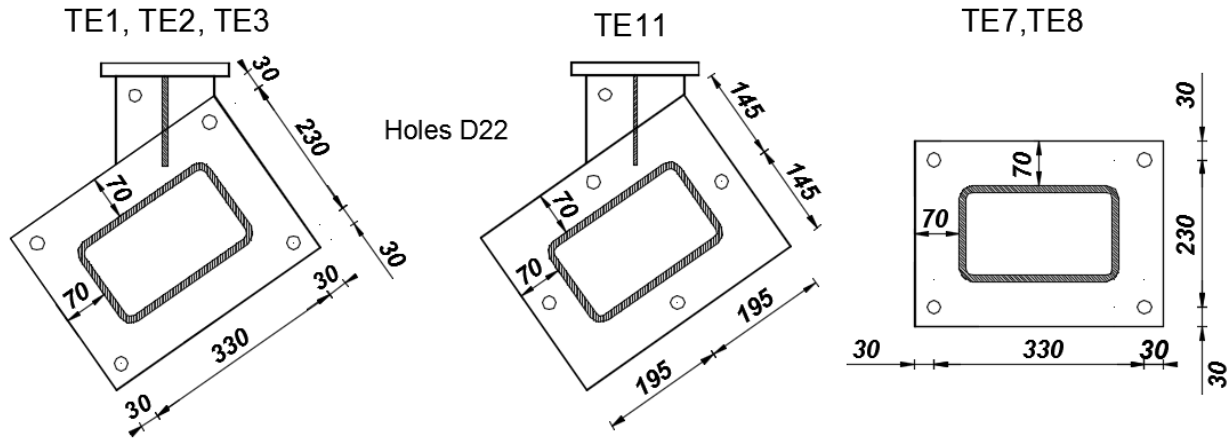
End plates $t \times 290 \times 390$. The diameter of the holes is 22 mm for the M20 bolts.
